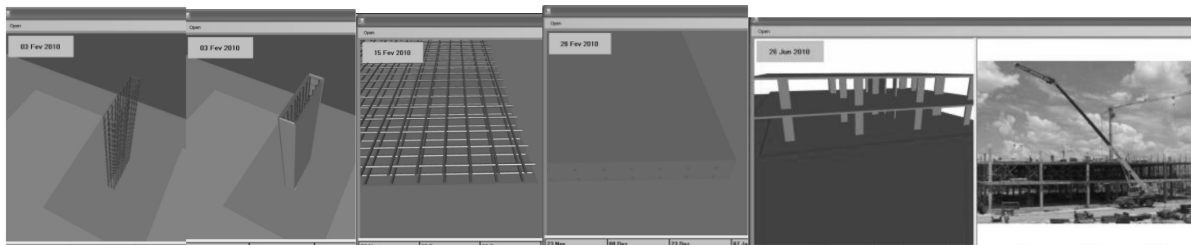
Column and slab construction: reinforcement, formwork and concreting and rotation applied to the model.
